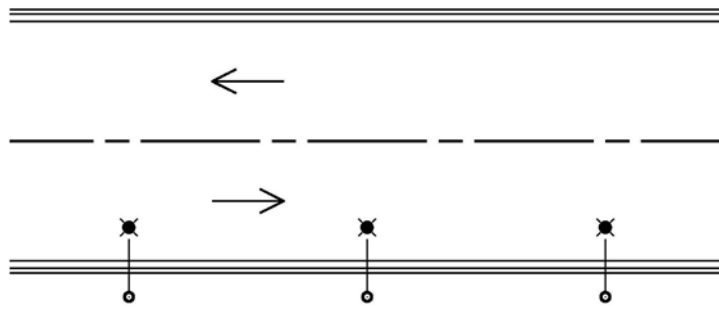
One Sided Roadway Lighting Pole Arrangement
